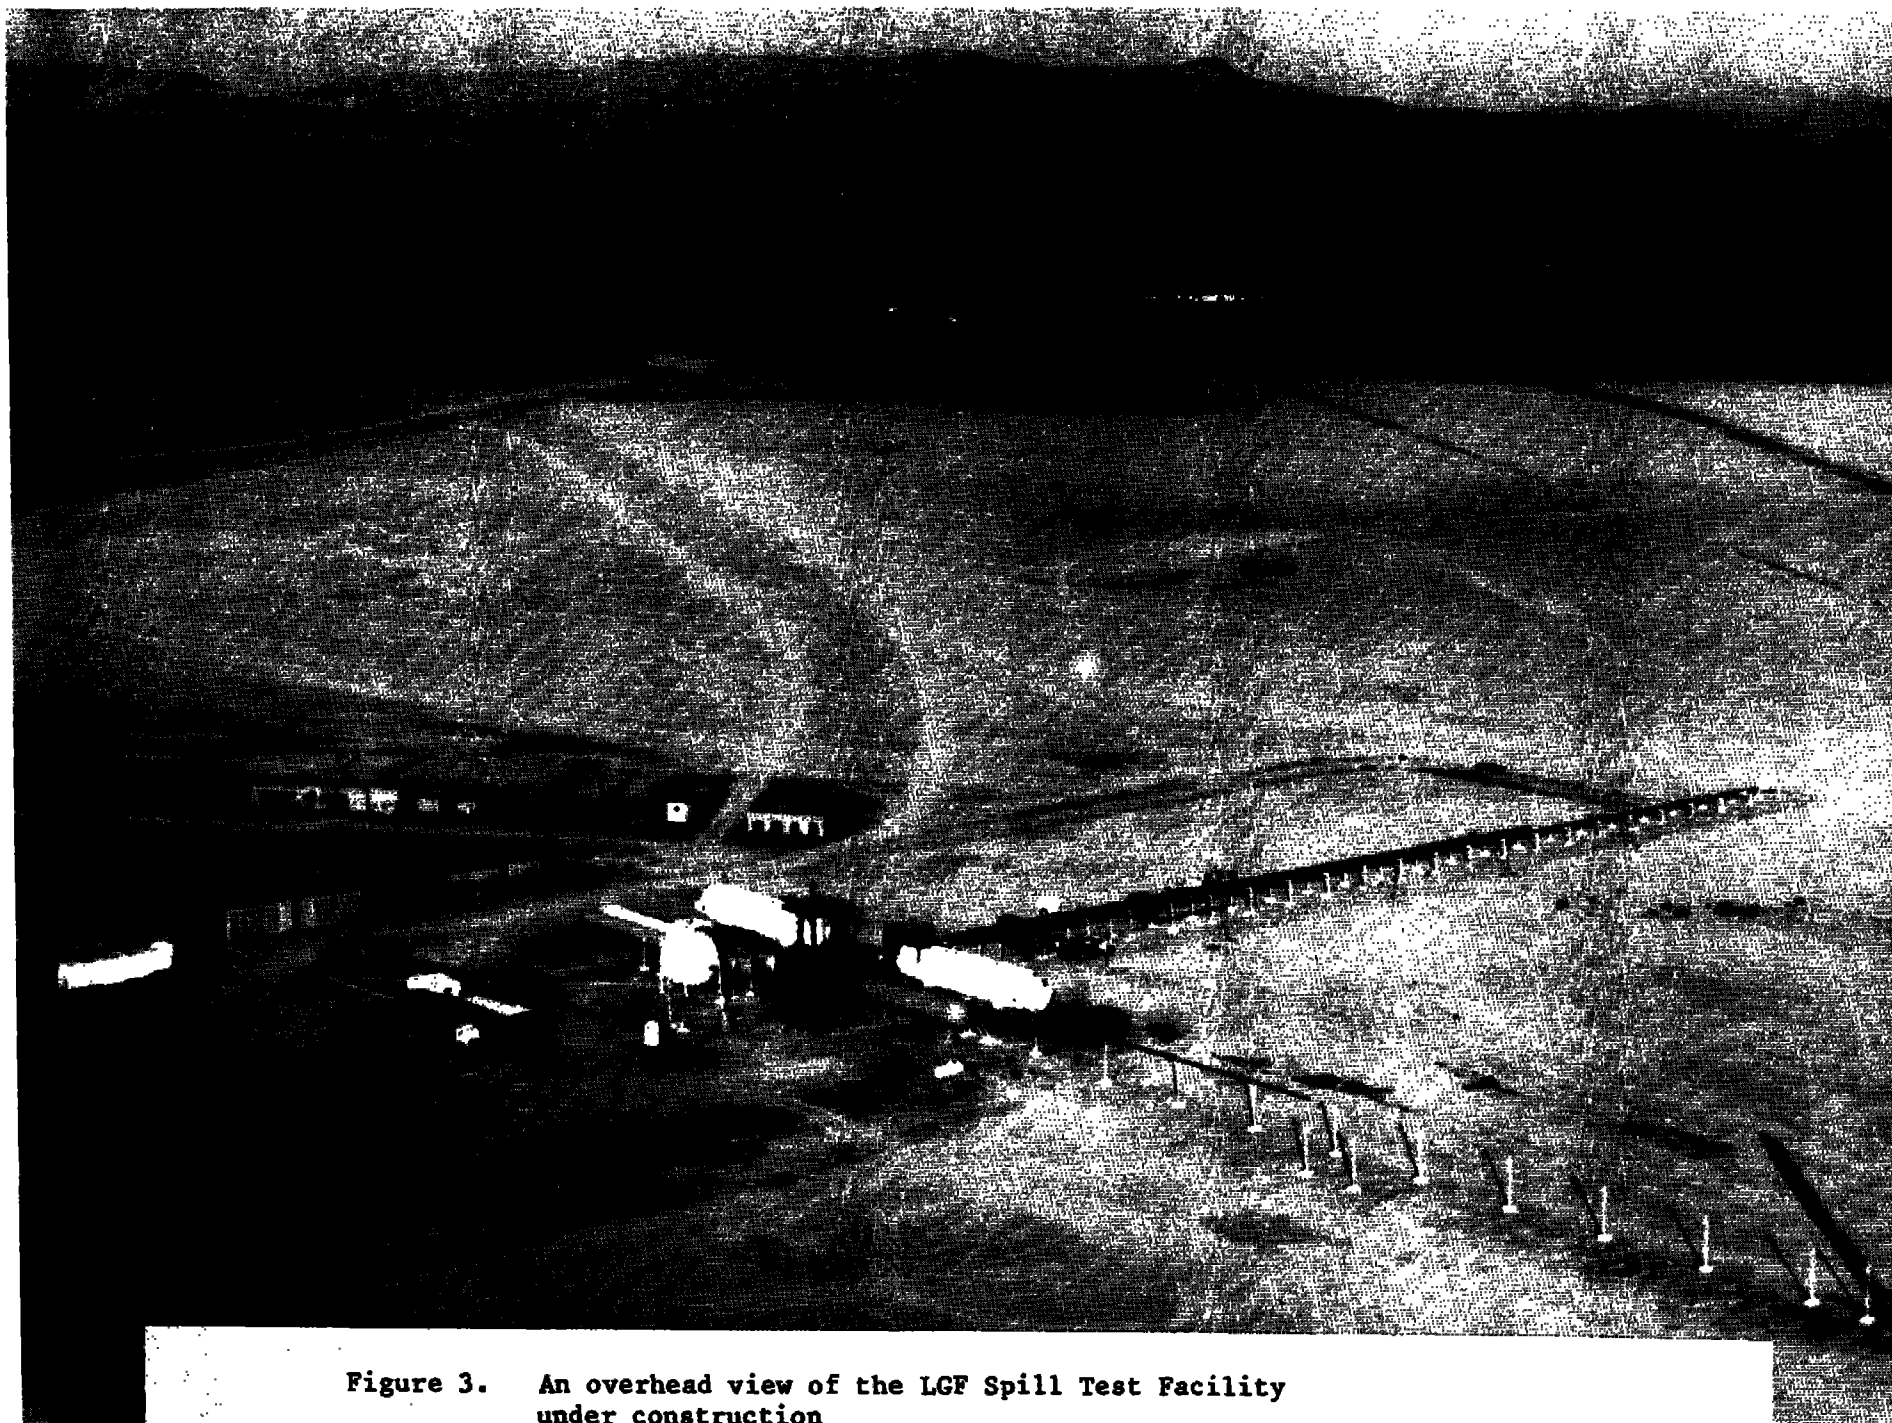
An overhead view of the LGF Spill Test Facility under construction
